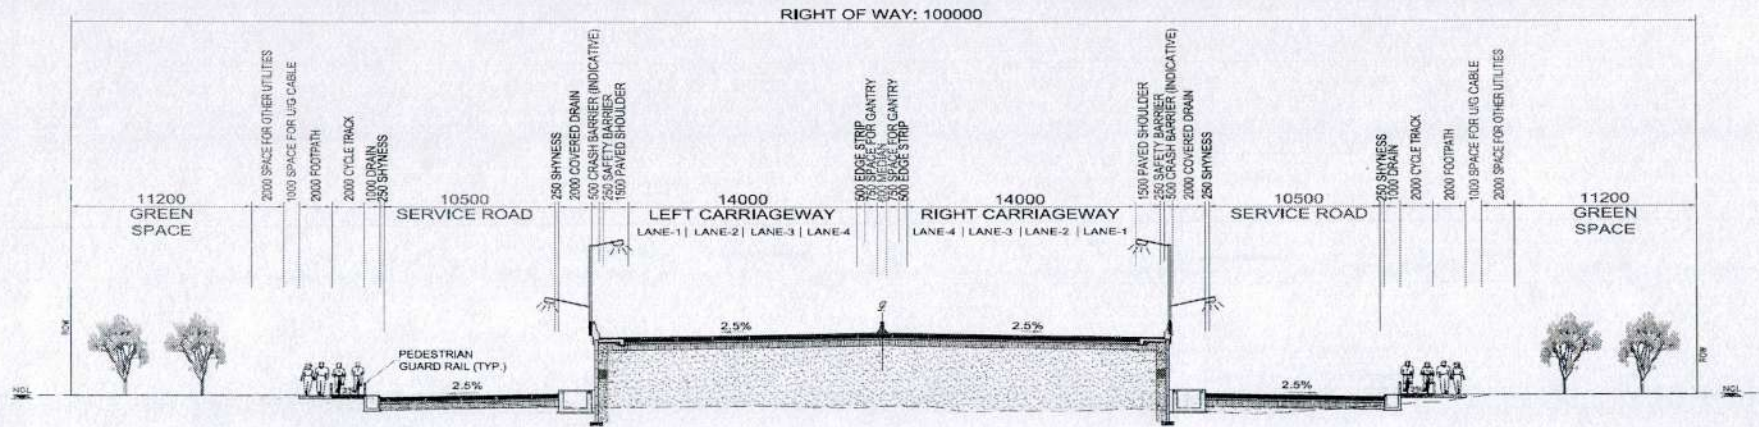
Typical Cross Section – At Hosur Road Flyover Approach Location
